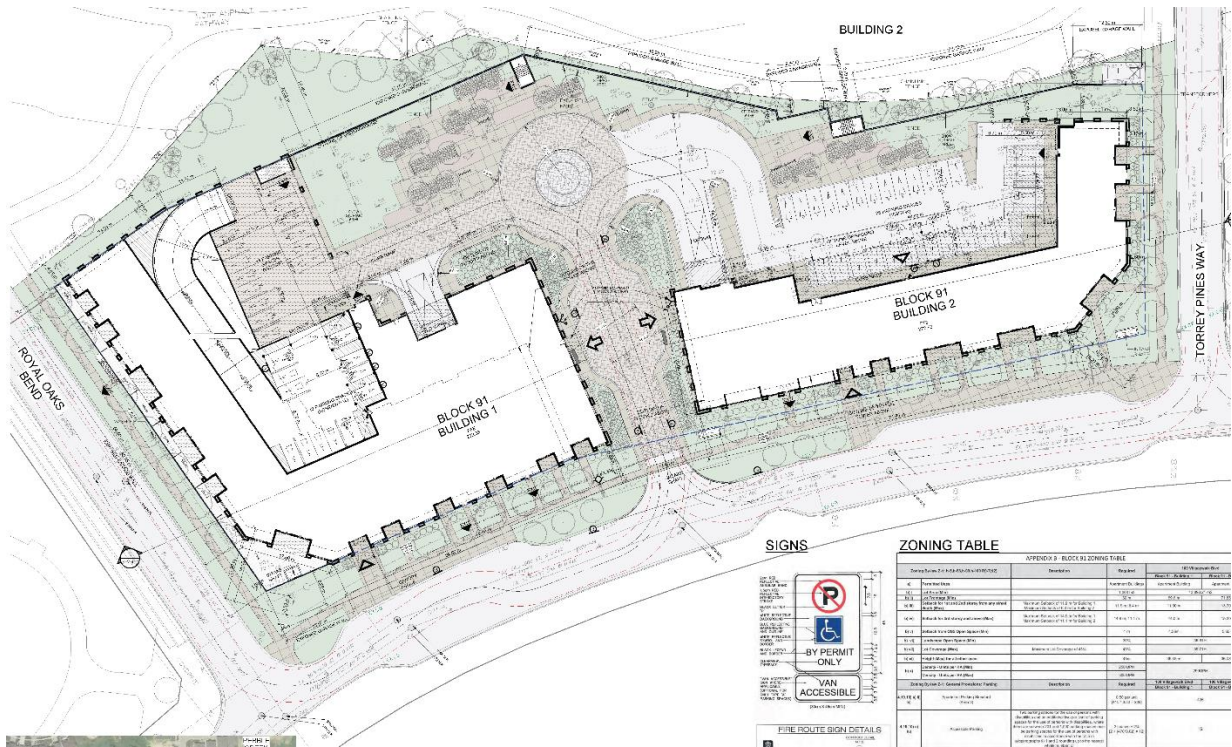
Conceptual Site Plan (100 Villagewalk Boulevard) (September 2023)
